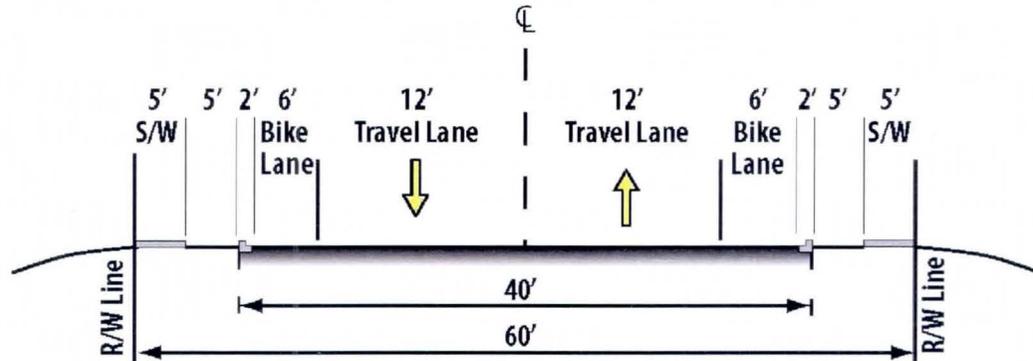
Ultimate Roadway Cross Section – Lost Dutchman Boulevard to McDowell Boulevard
